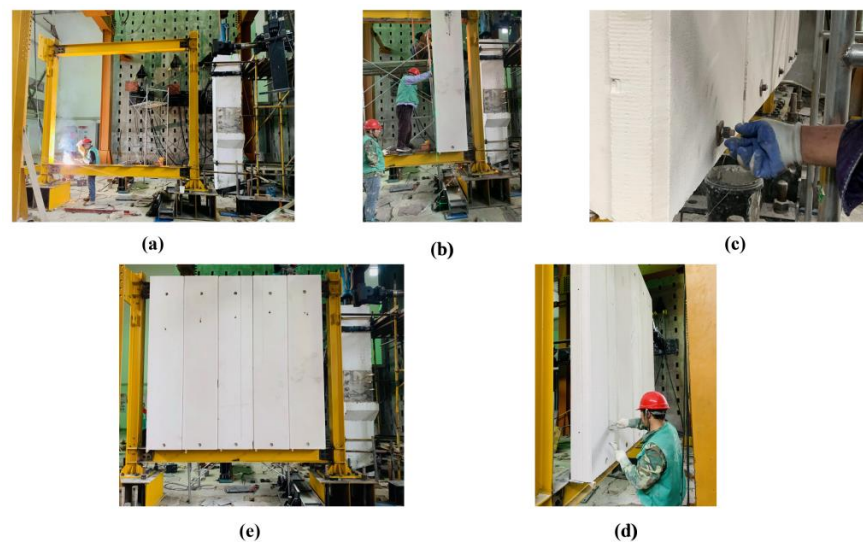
Images depicting the different stages of test piece installation: (a) installation of the steel frame; (b) installation of AAC wall panels; (c) installation of bolts; (d) application of mortar in AAC joints; (e) completed installation.
